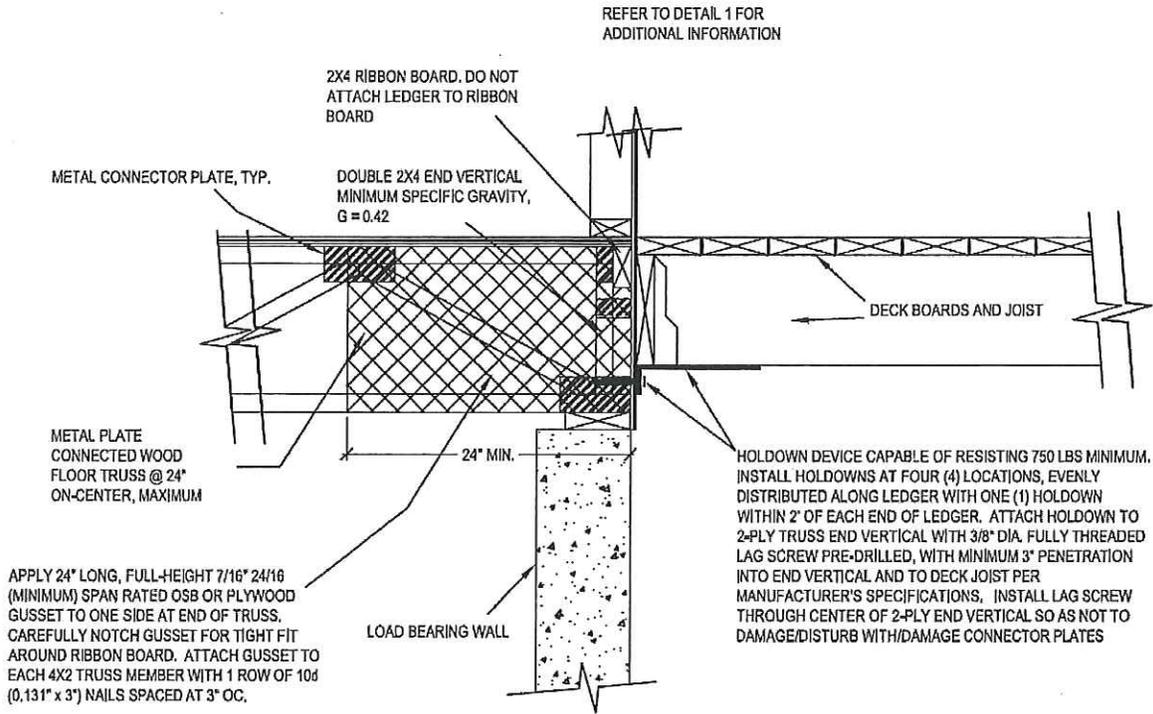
Attachment of Deck Ledger to Floor System with MPCW Trusses,
